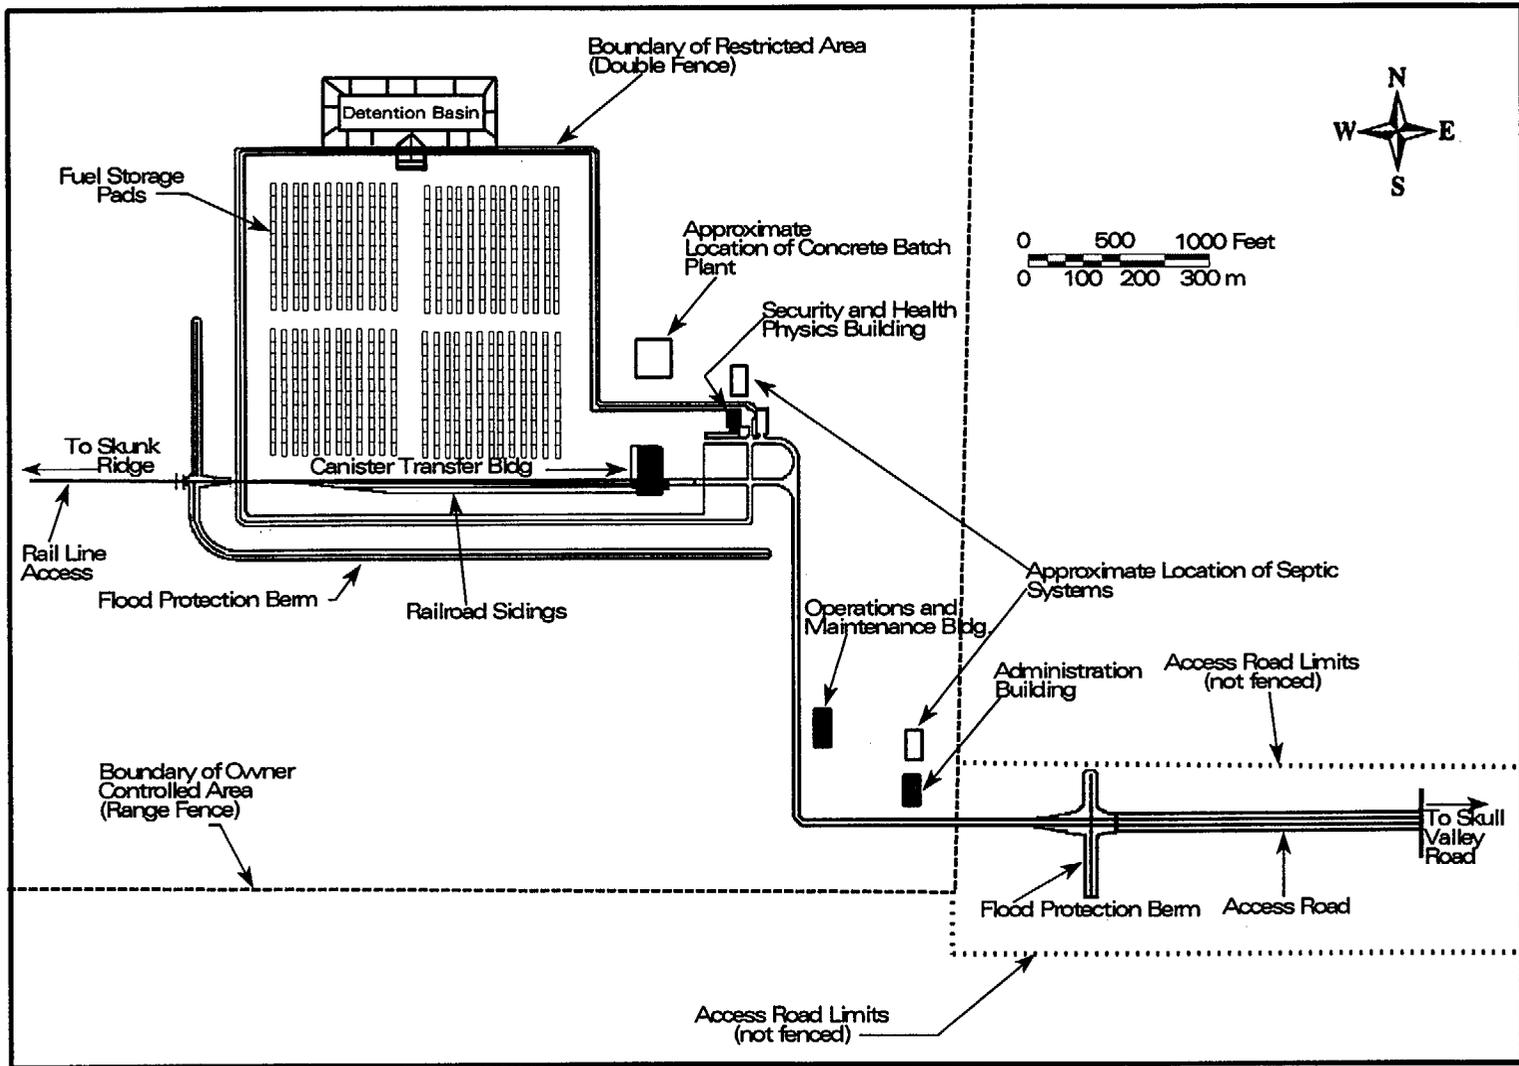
Basic site plan and layout of structures and facilities at the proposed PFSF.
